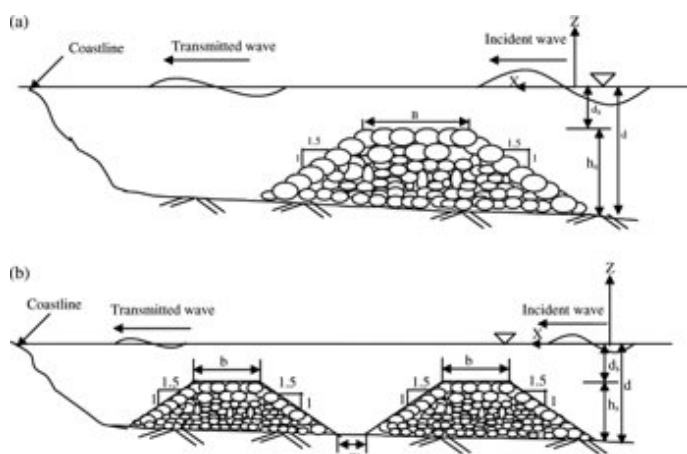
Typical cross section of offshore (submerged) breakwater
